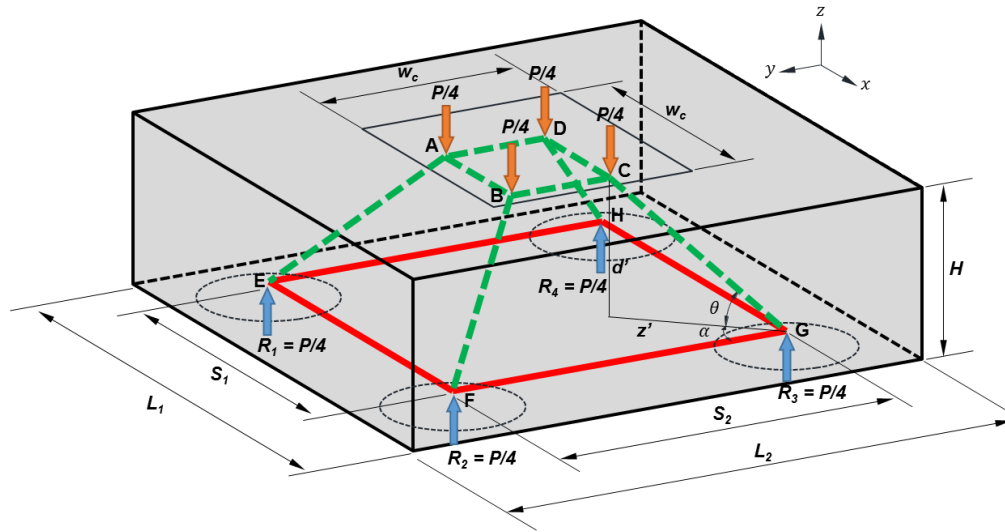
Dimension of a drilled shaft footing for 3D STM calculation
